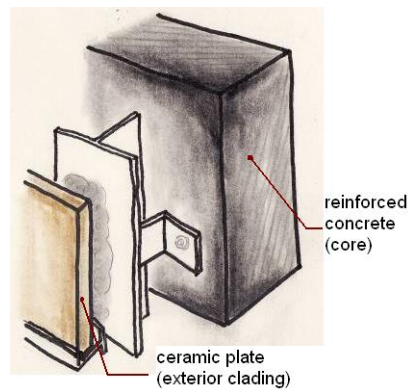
Ceramic tile finishing on reinforced concrete wall core.
